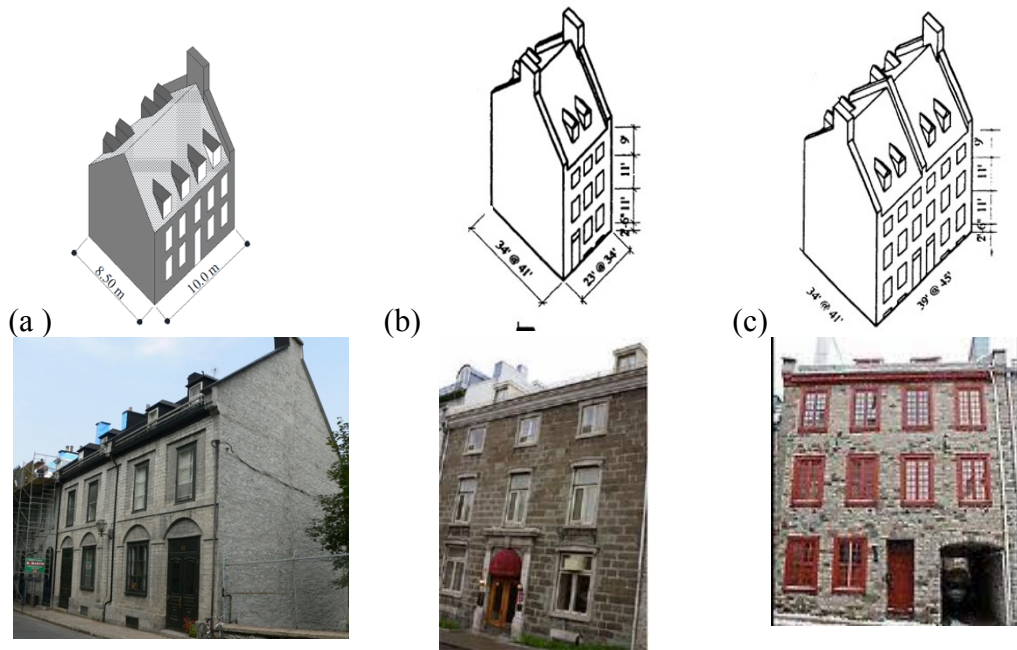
Typical stone masonry buildings: a) 1760-1800; b) 1800-1830; c) 1830-1850
